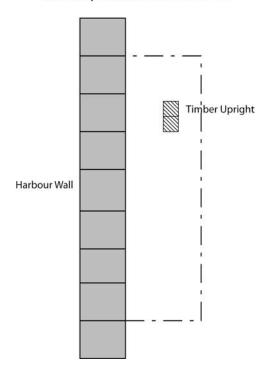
Sketch plan of Abutment 1a (approximate scale 1:100)
